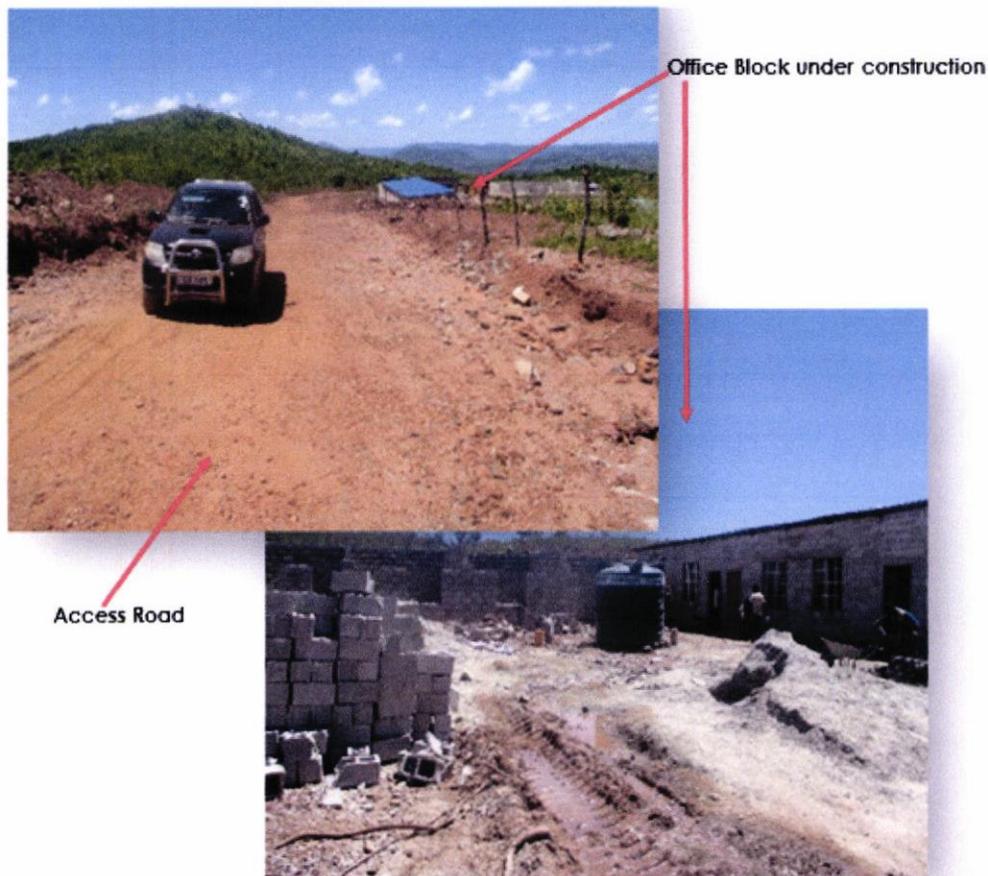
(2): Showing the constructed Access Road and Office block under construction.
